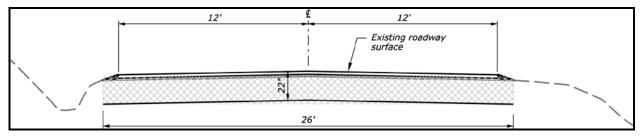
TYPICAL FULL-WIDTH SUBGRADE REINFORCEMENT
